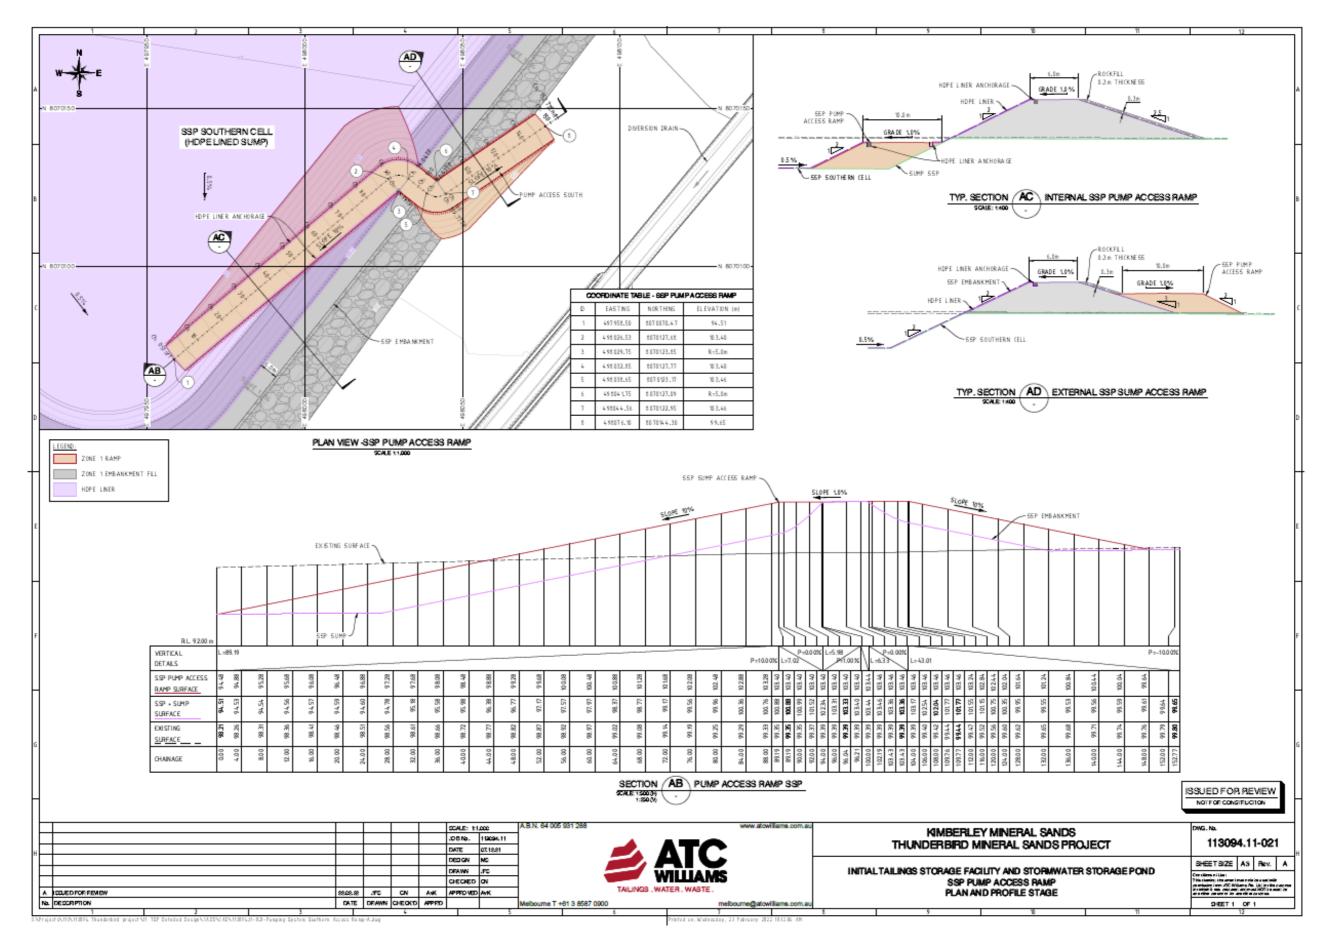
Drawing – Initial TSF and SPP, SSP pump and access ramp, plan and profile
